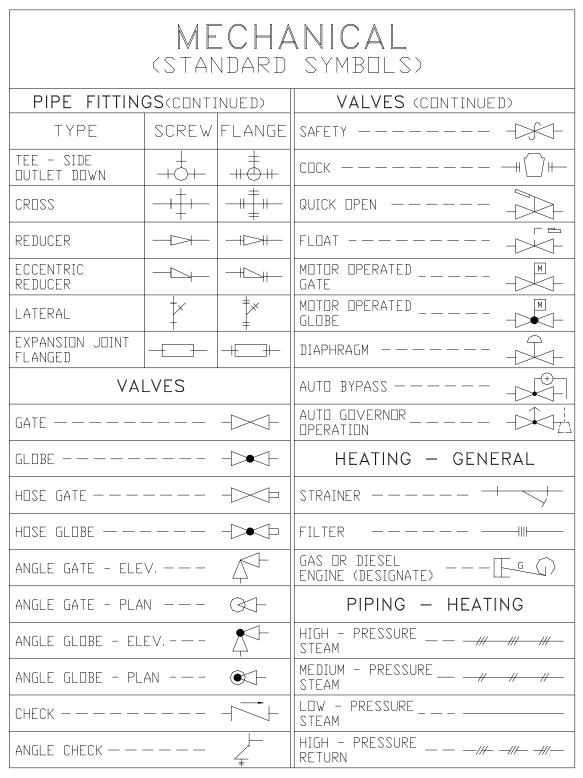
Mechanical Symbold (Sheet 3 of 4)
